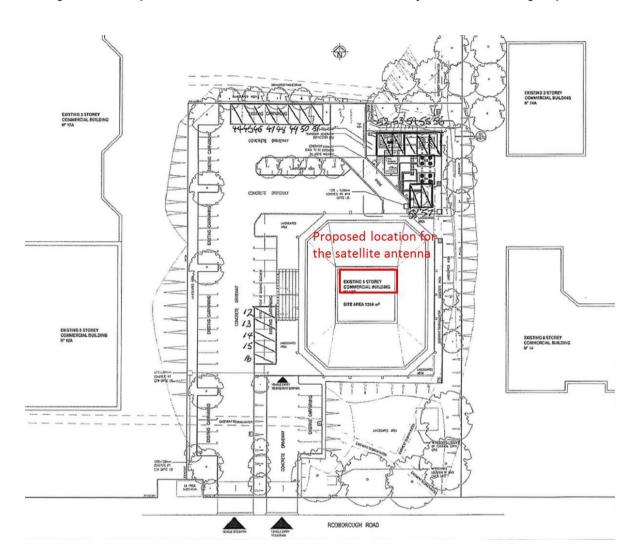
Proposed Satellite Antenna Location at National Playout Centre Building, Top View
